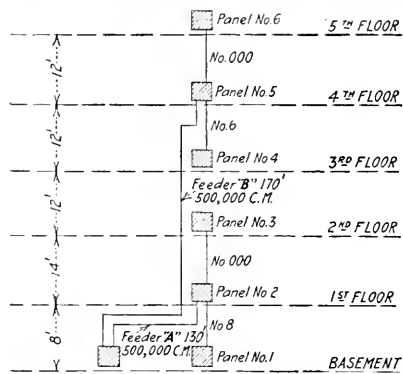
RISER DIAGRAMS FOR FACTORY BUILDING
